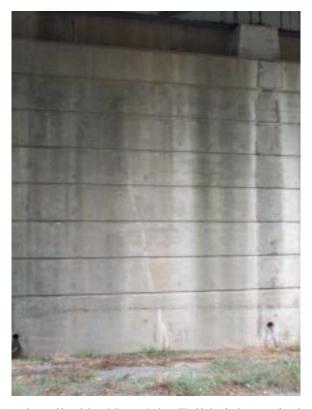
Deterioration described by Note A4 – Full-height vertical crack in north abutment.
